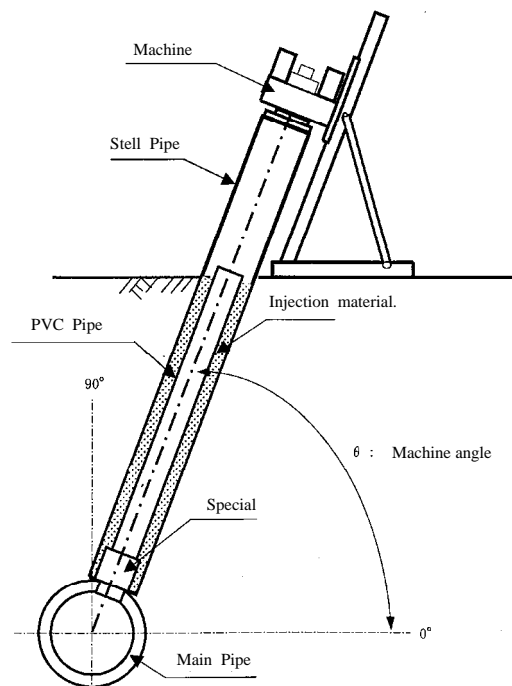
Overview of the Collecting Sewer Pipe Jacking Method
